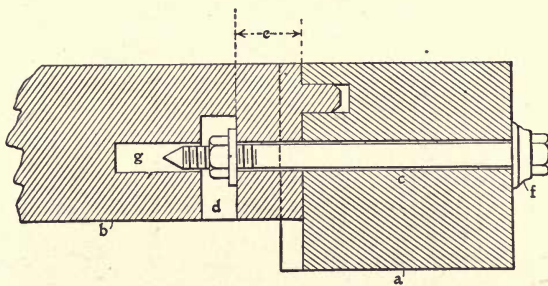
HOLDING POWER OF JOINT-BOLTS.
